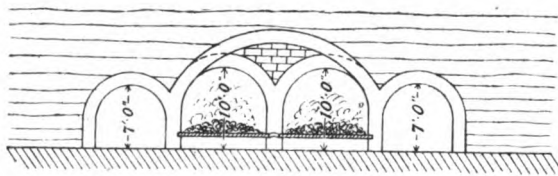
Front Elevation of a Ventilating Furnace showing Travelling Roads (Air-spaces) on either side.
